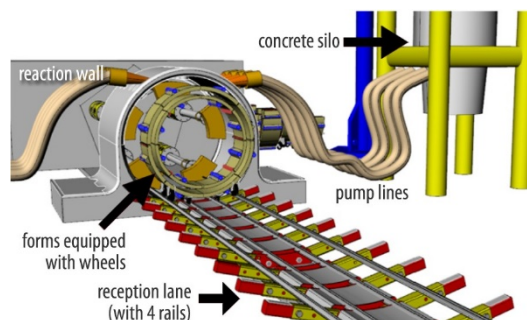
Incremental launching facilities with concreting point, reception lane and first set of wheeled forms in place waiting to be filled by pumps.
